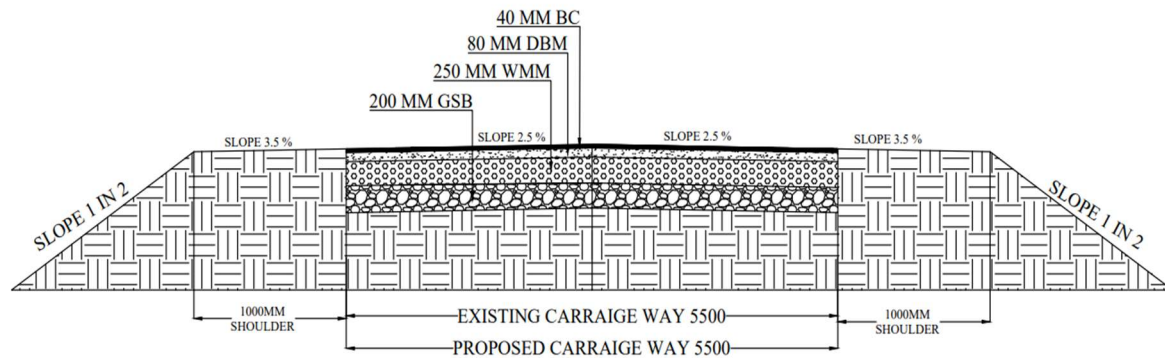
Typical Cross Section of pavement for original Soil Subgrade of CBR 3.36
